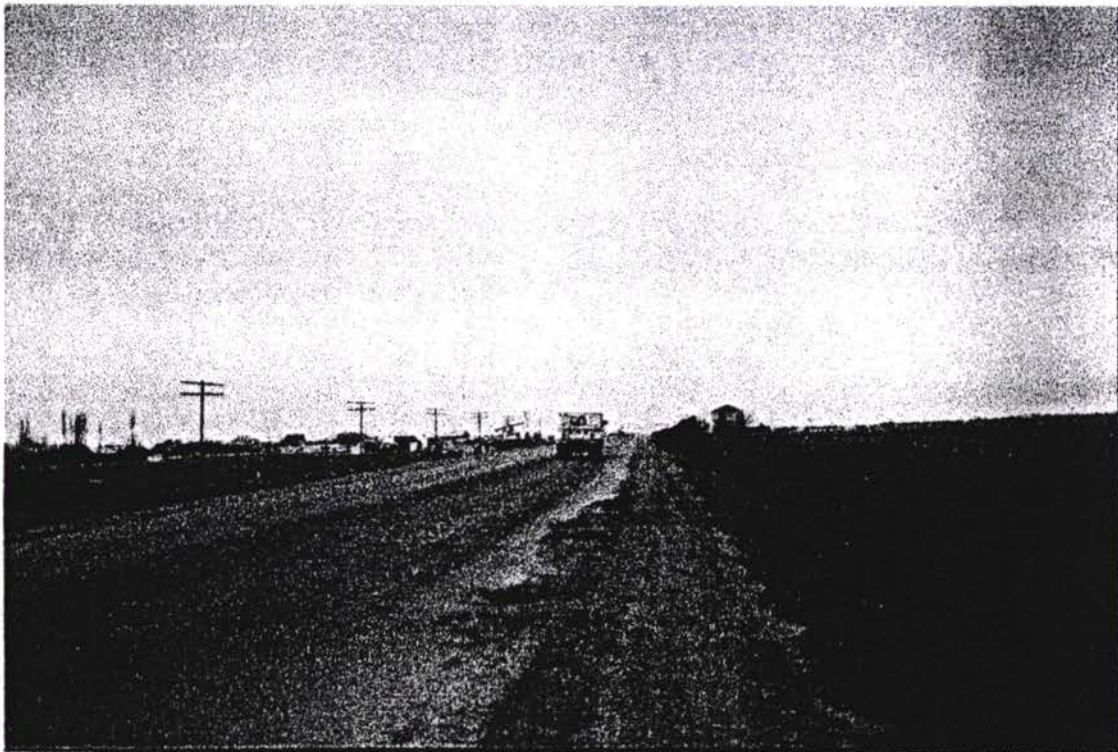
Typical road view between Ganja bypass- Shamkir (at 120 km from border)
